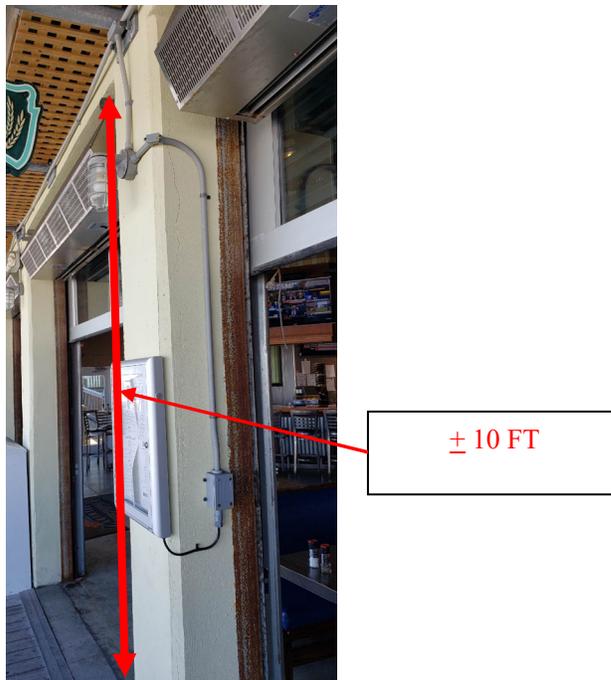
Location 27: Approximately 10 ft long new 16x12 concrete column.
